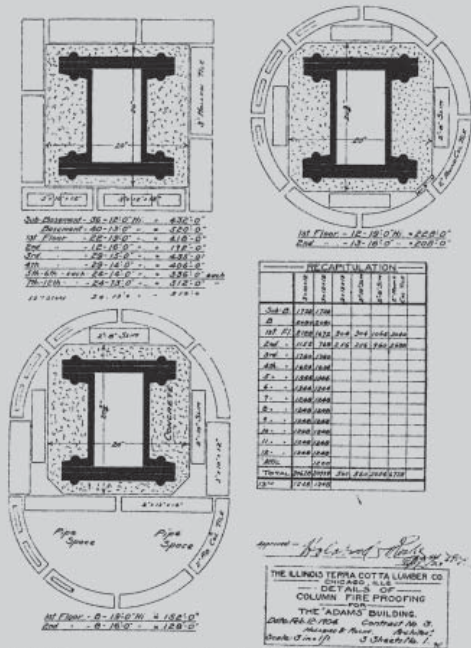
SECTIONS SHOWING CHANNEL-AND-PLATE STEEL STAYED AND METHOD OF FORTIFYING STEEL IN THE "ADAMS" (NOW THE REPUBLIC) BUILDING, ADAMS AND STATE STREETS, CHICAGO.
